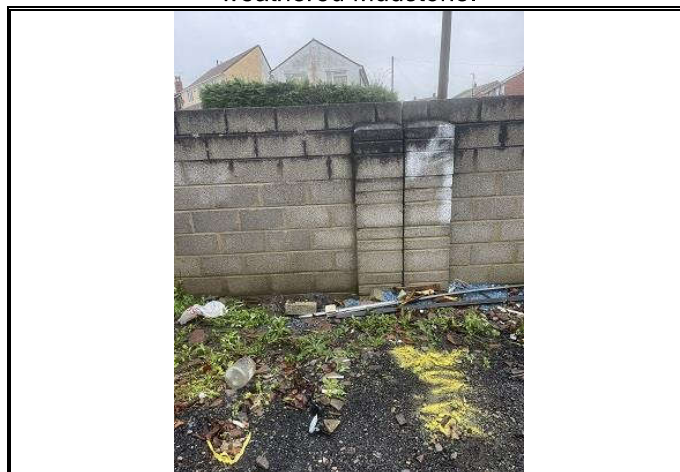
/1057/R3/P11 – Location and commencing surface at Window Sample WS2 – at the western side of the site.
